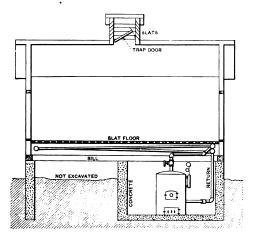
Vertical Cross Section of Kiln, Showing General Arrangement.
